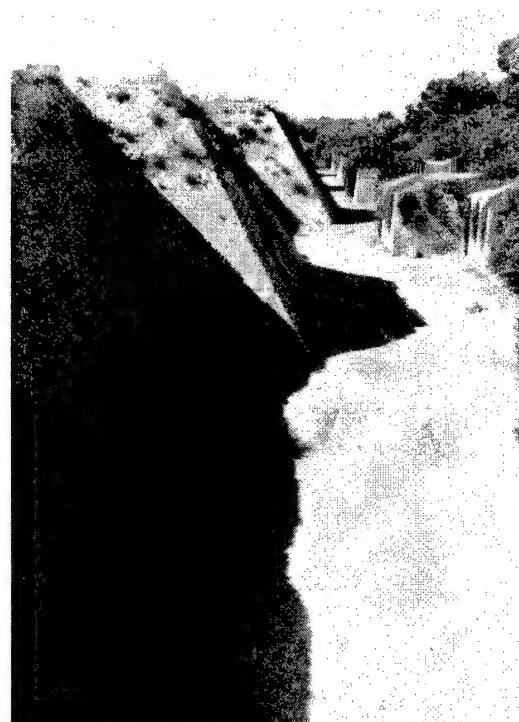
East Wall Moat and Counterscarp. (View north, from bridge of east gatehouse). The counterscarp (right) served as a retaining wall for the dry moat, preventing the enemy from gaining easy access to the glacis (left).
